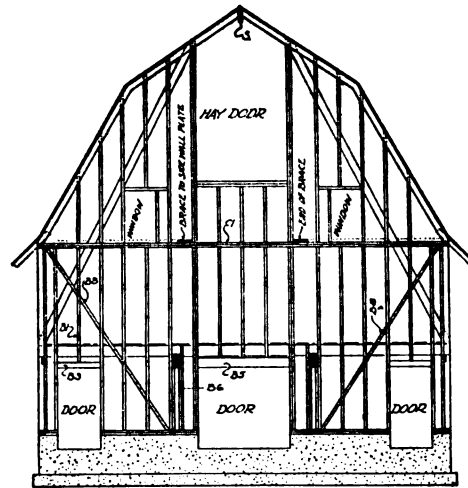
End framing of a 36-foot wide barn built on the oraced-rafter type. This design makes the use of a hay hoisting rig and track (S) practically essential.
